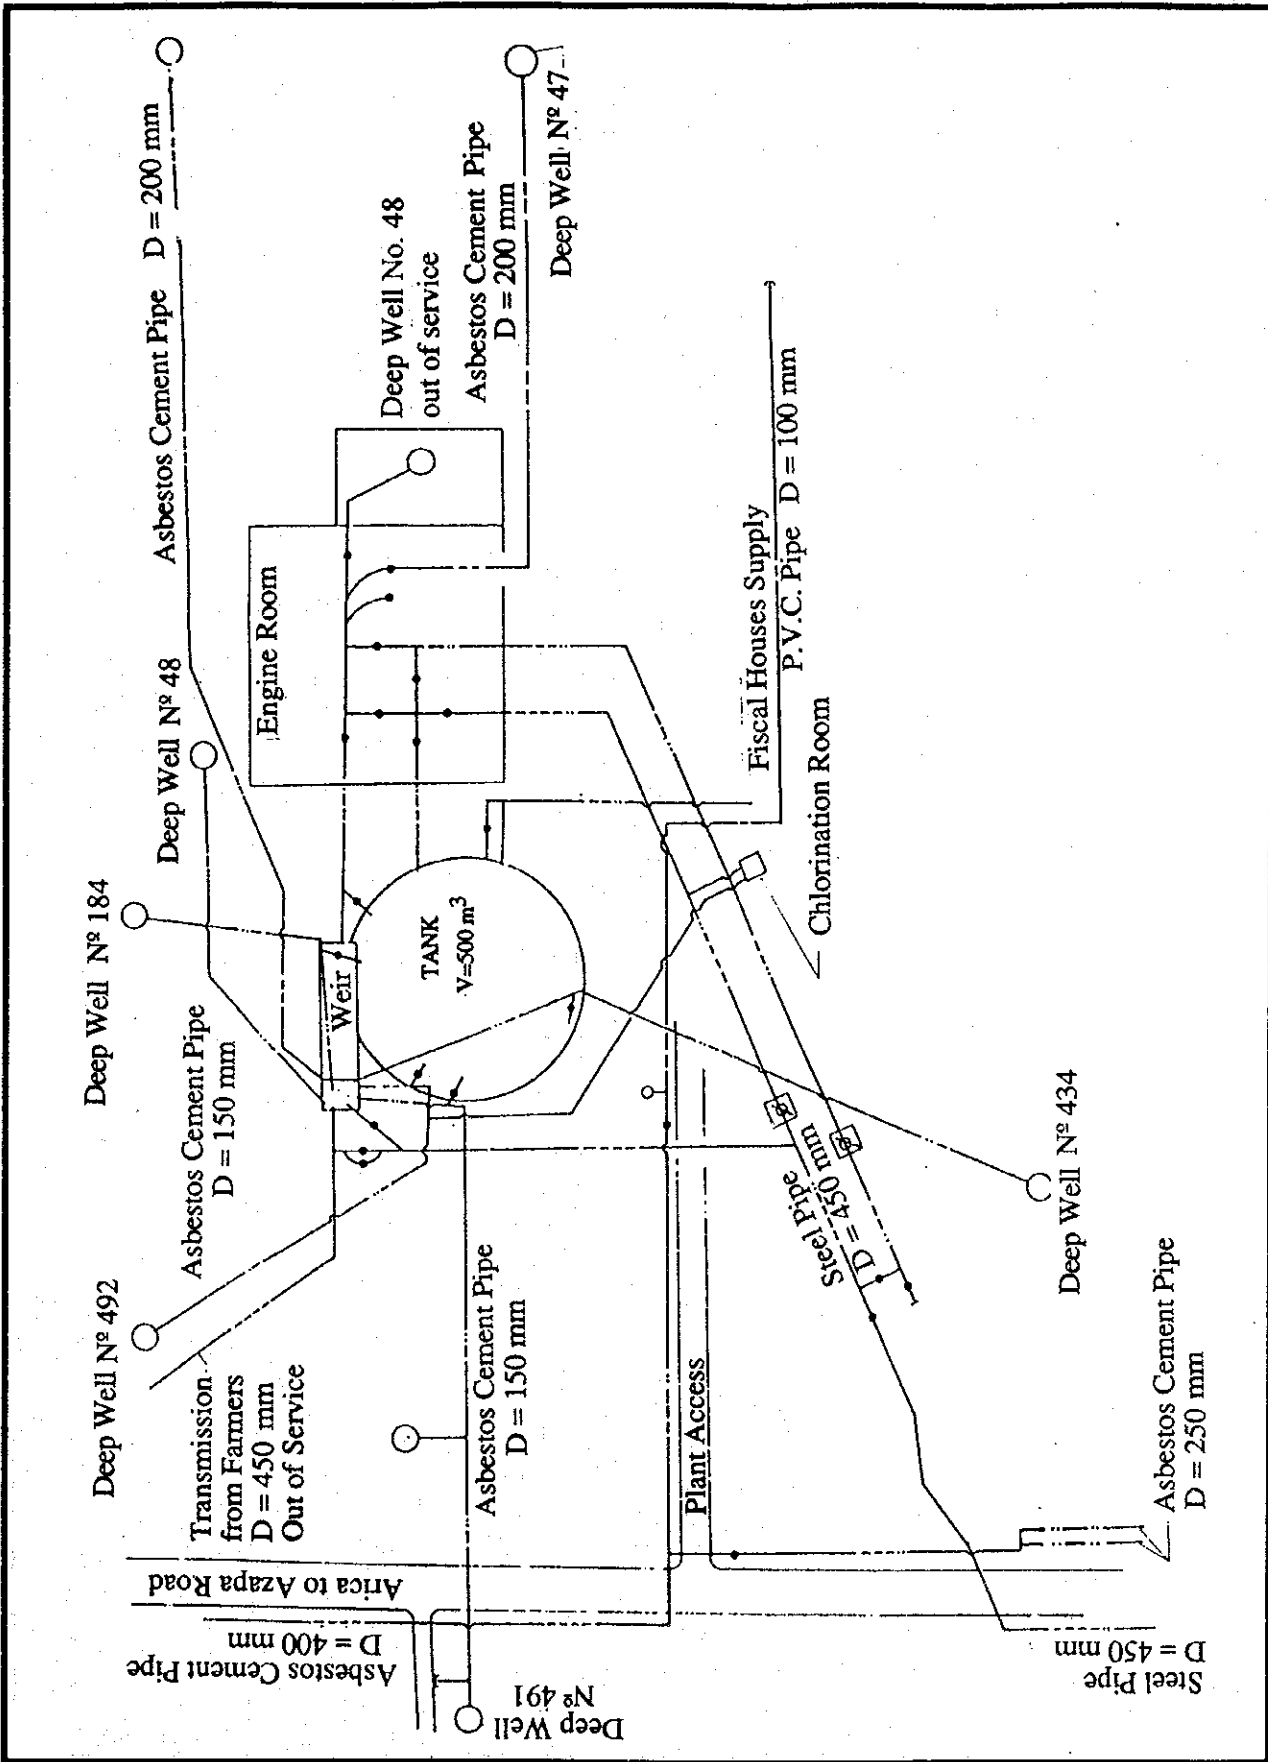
Azapa Plant Layout - Arica
